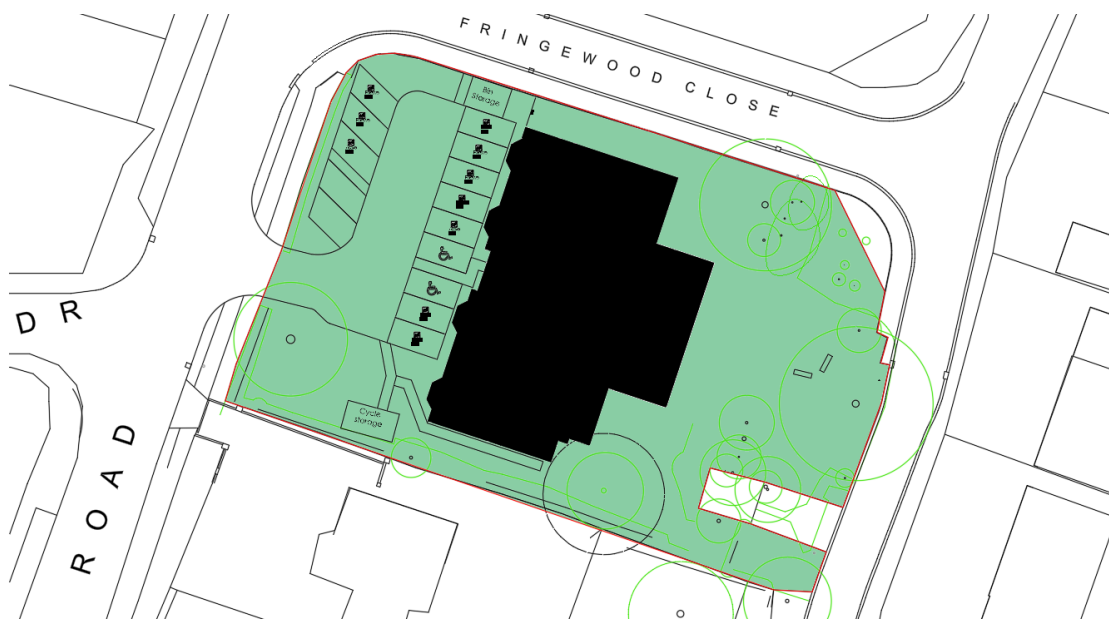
Site Plan of 137 Ducks Hill Road from Application: 16109/APP/2020/234
